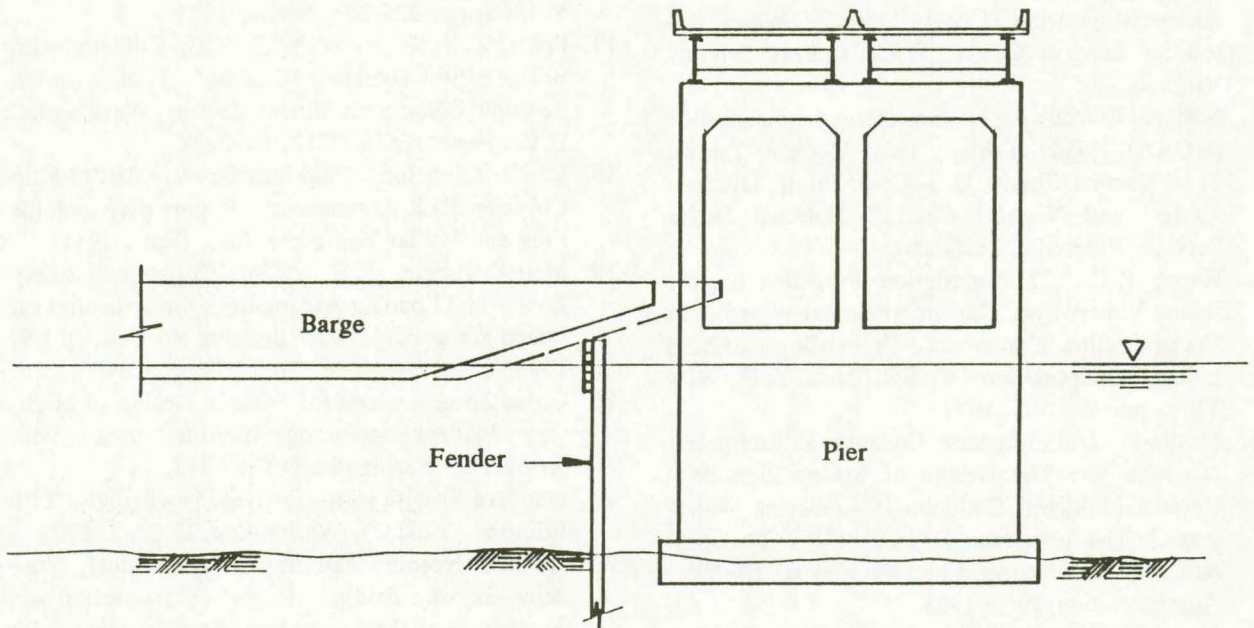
Elevation of Barge Overhang Impacting Pier Behind Fender.
